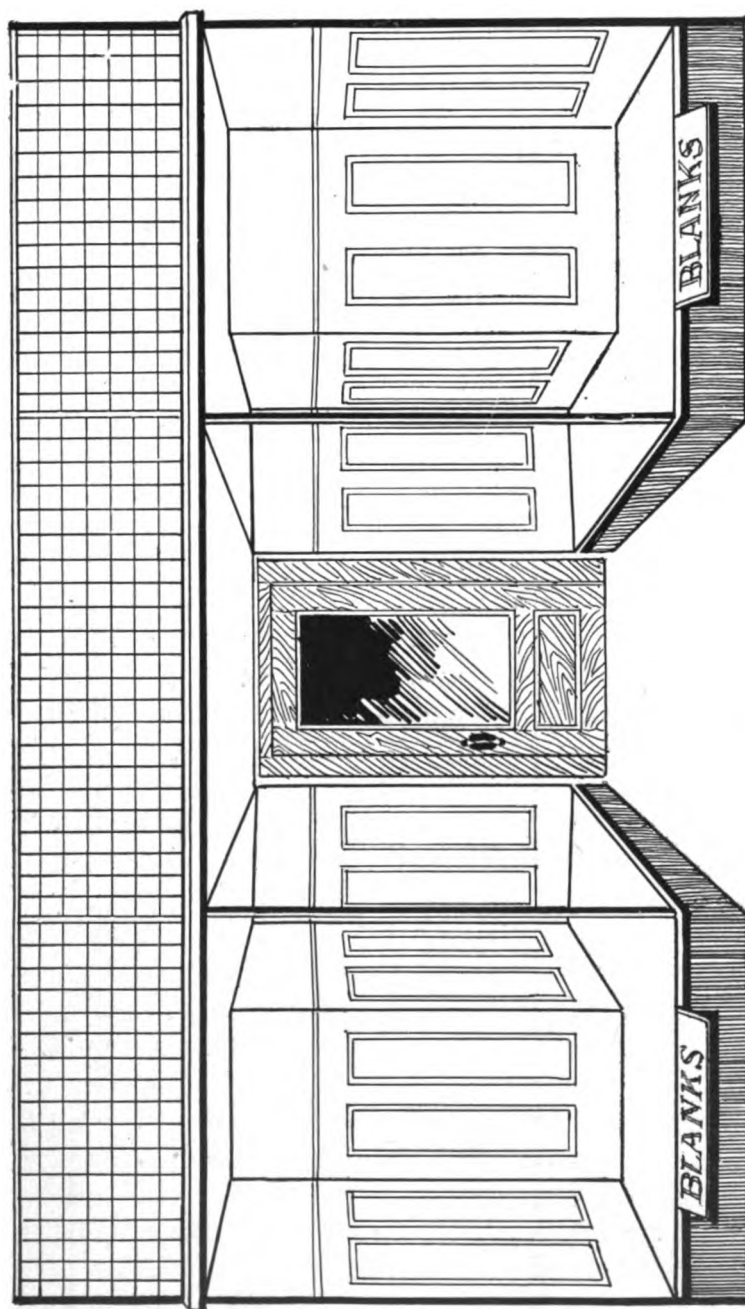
PERSPECTIVE DRAWING OF STORE FRONT SHOWING PRISM LIGHTING ARRANGEMENT.
